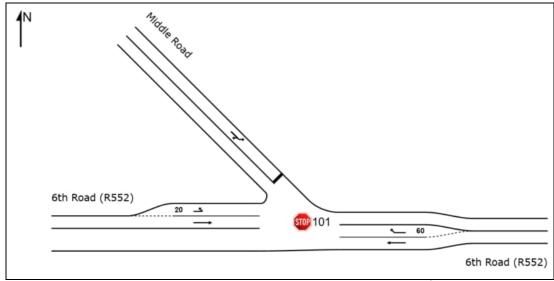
Existing Geometric Layout of the Middel Road & 6th Road Intersection
